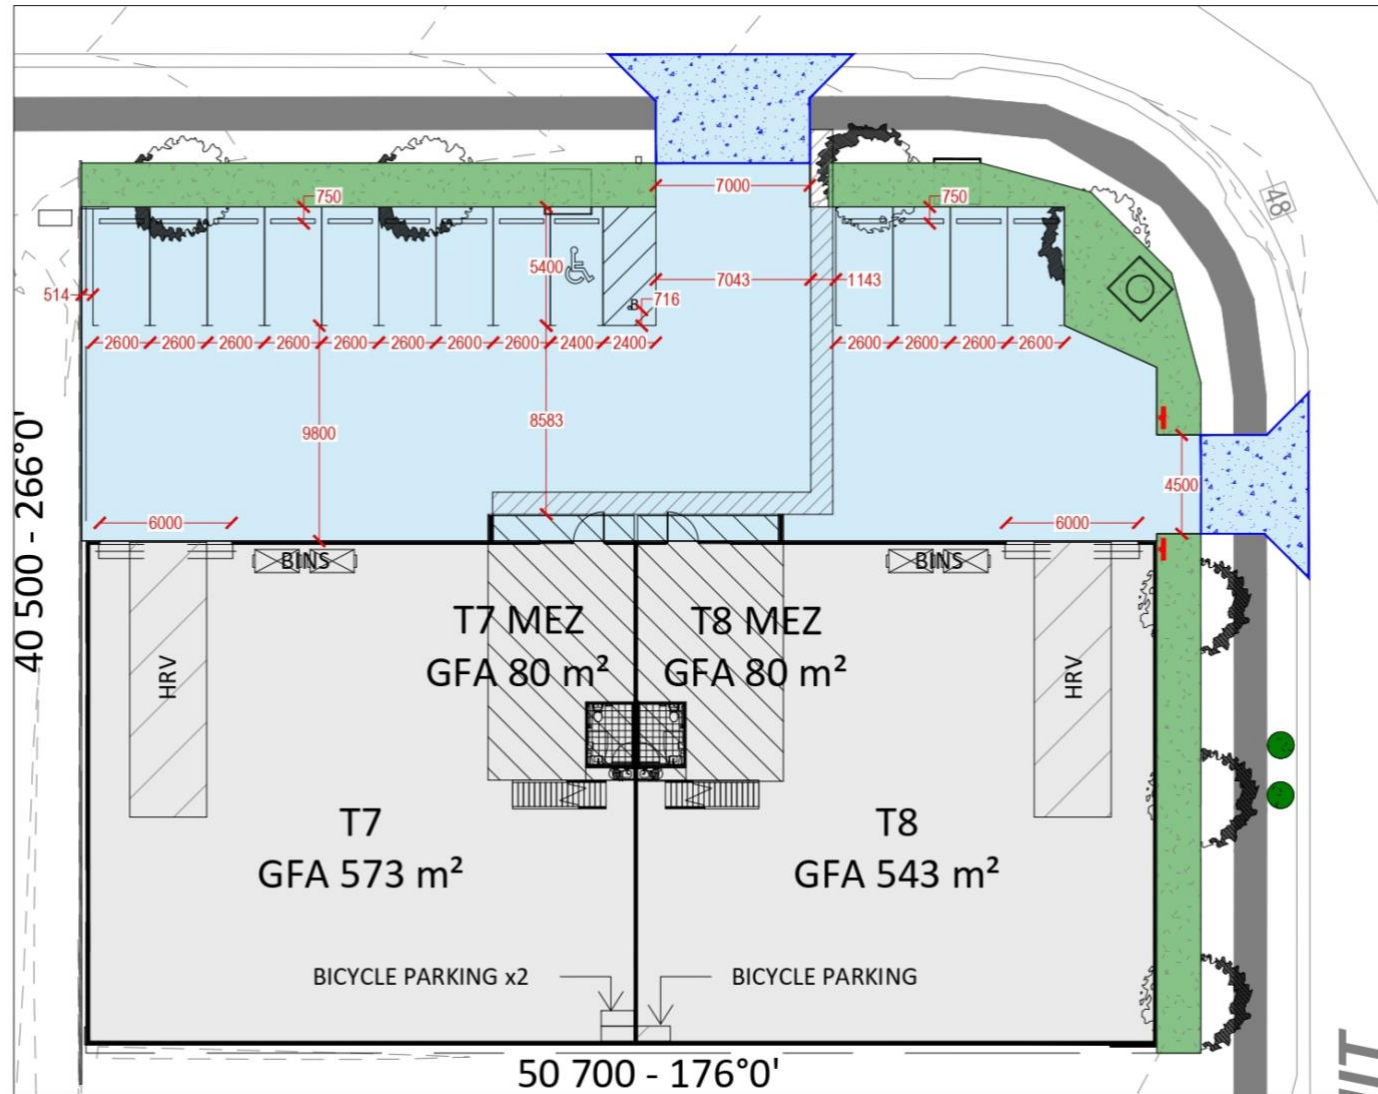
PROPOSED CAR PARKING LAYOUT AND DIMENSIONS
